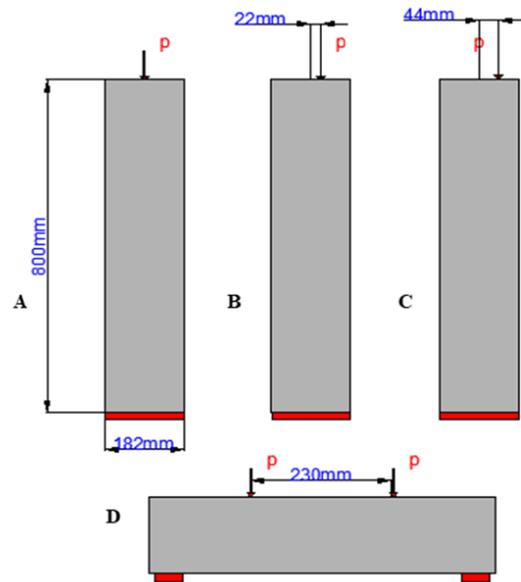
Typical setup of the loading tests, A) central load, B) Eccentricity= 22mm, C) Eccentricity= 44mm and D) Two-point load.
